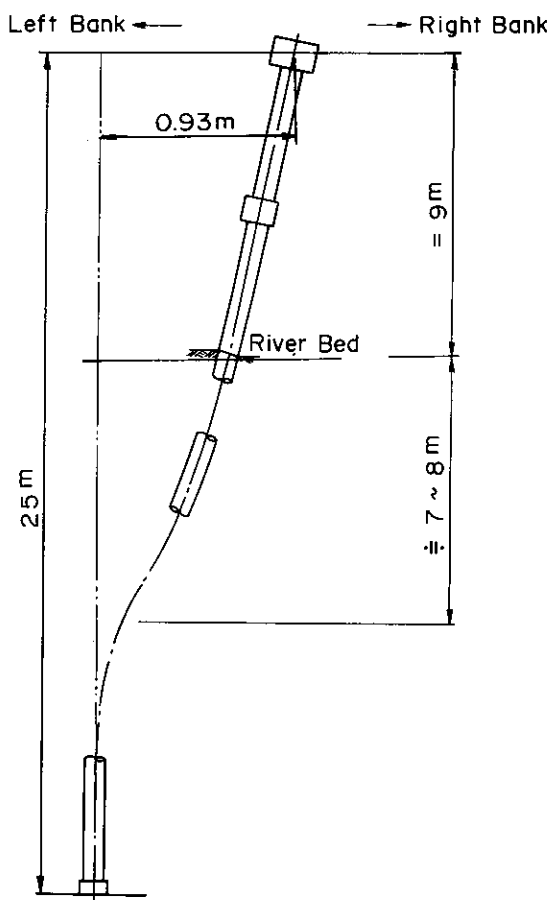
Damage to steel pipe piles of pier P<sub>4</sub> of Showa Bridge<sup>(1)</sup>
